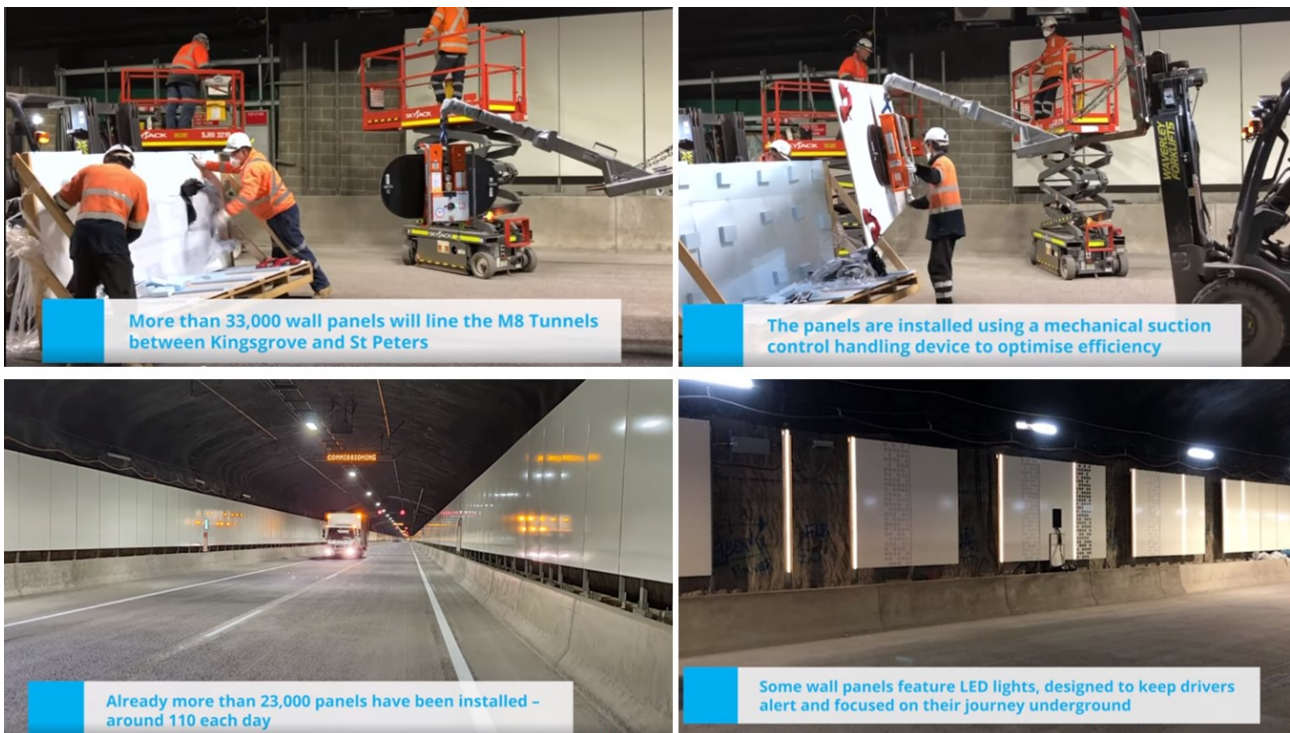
Installation of architectural panels in the M8 (courtesy @WestConnex Facebook page)
